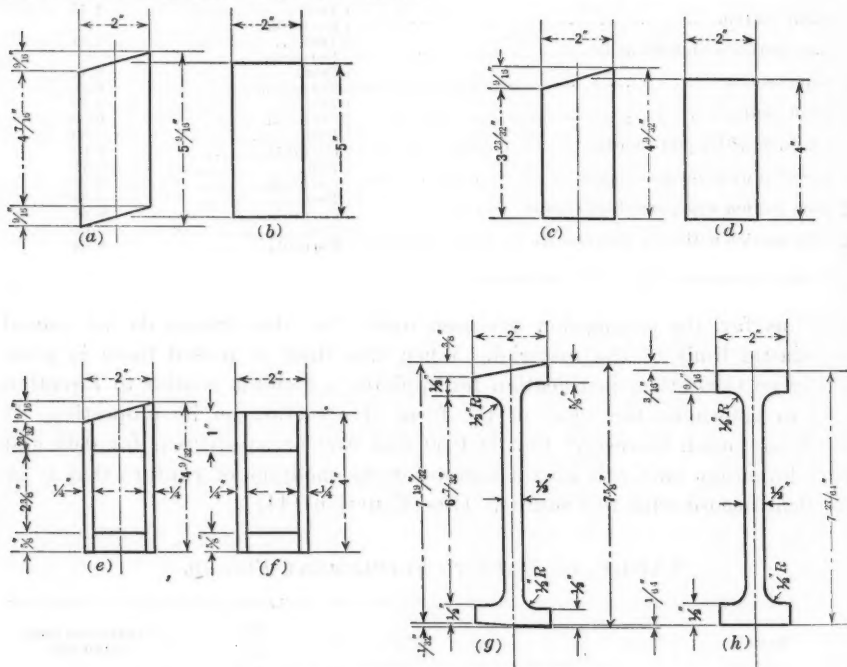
EQUIVALENT BEAM SECTIONS.
